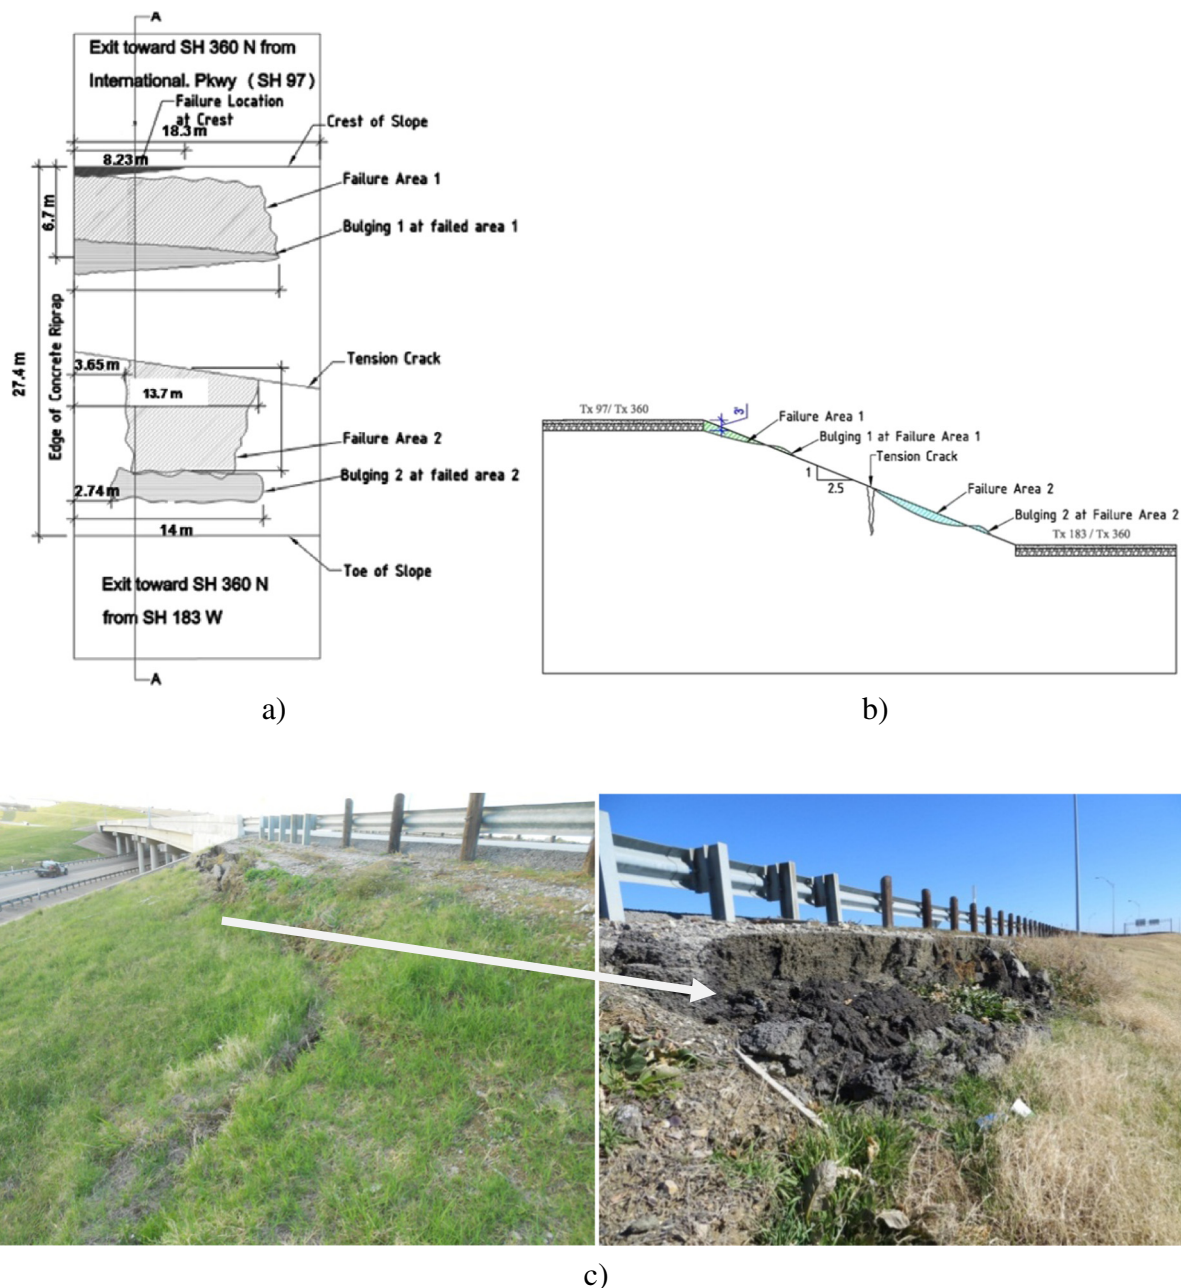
(a) Failure Condition of SH 183 Slope (Plan View), (B) Section 1–1, (C) Failure near Crest.
